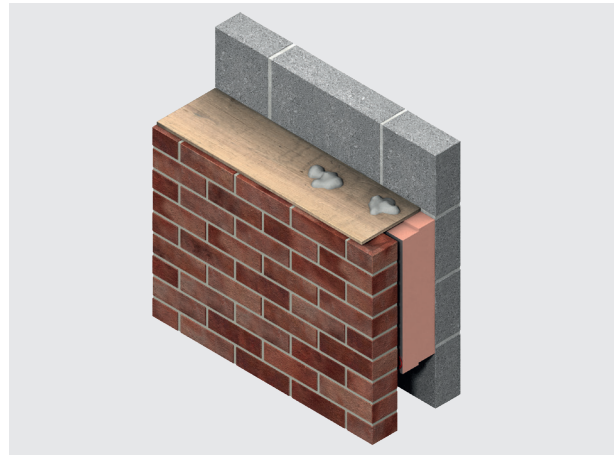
Use of a cavity board to protect the cavity and insulation board top edge
